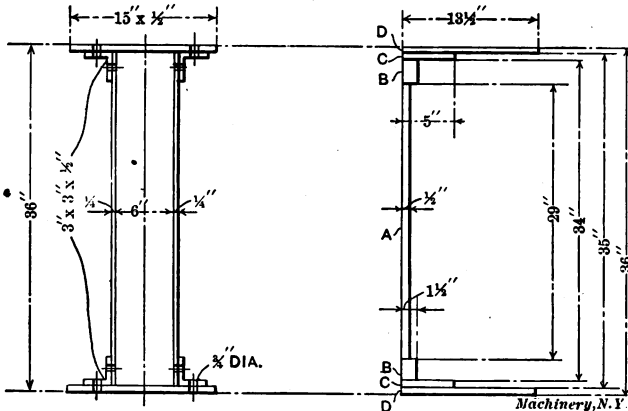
Proposed Section of Girder, drawn to convenience its Calculation
